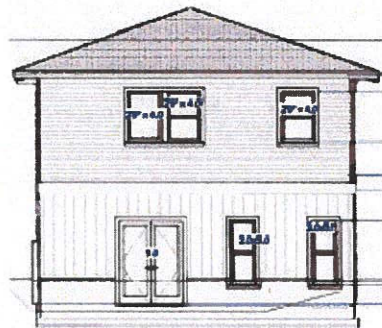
Proposed House Elevations – Lot A (from plans by Jerry Vander Wal)
